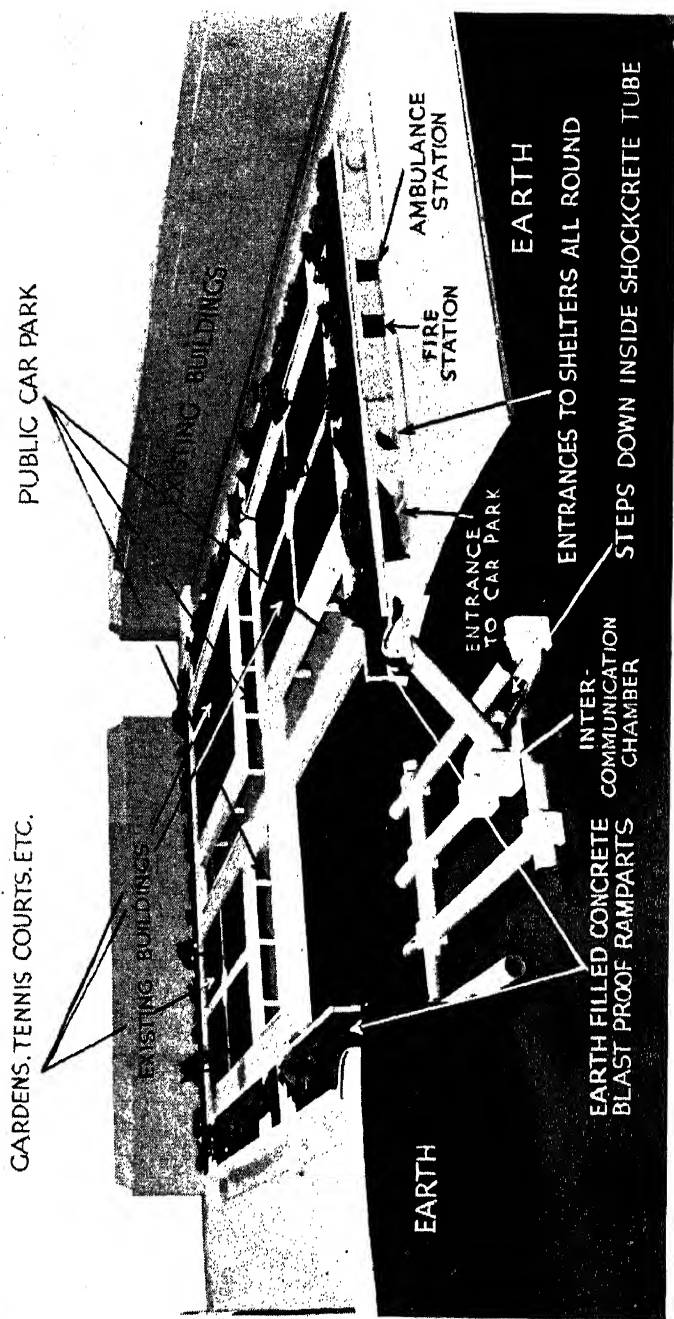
Model showing tunnel shelters under public gardens, tennis courts, etc., raised to roof a public car park.
